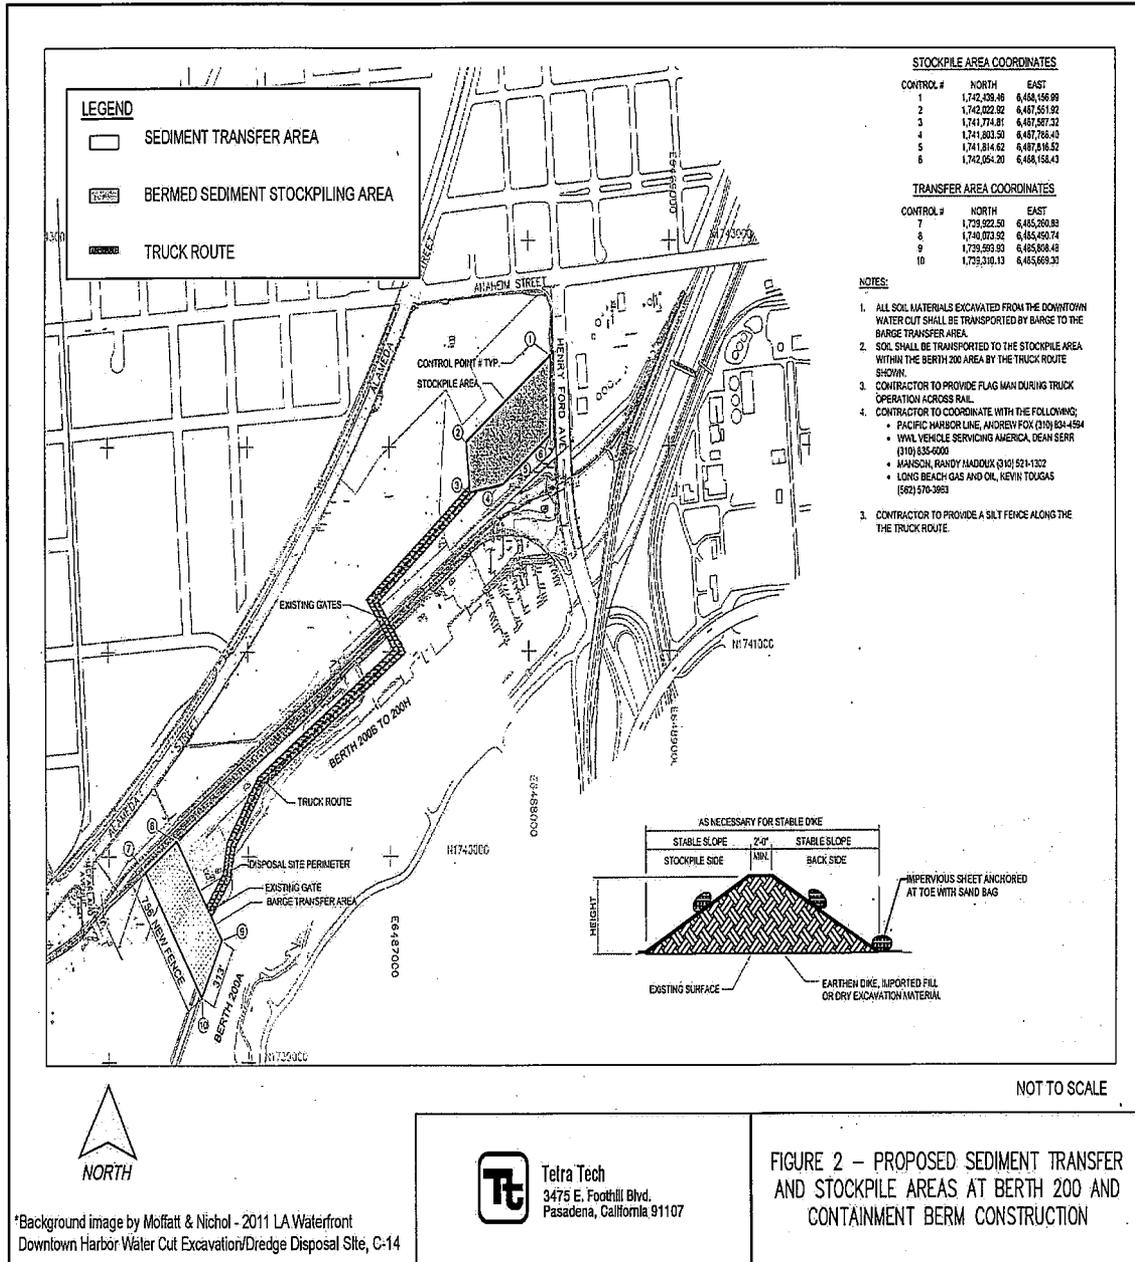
Proposed sediment transfer and stockpile areas at Berth 200 and containment berm construction.
